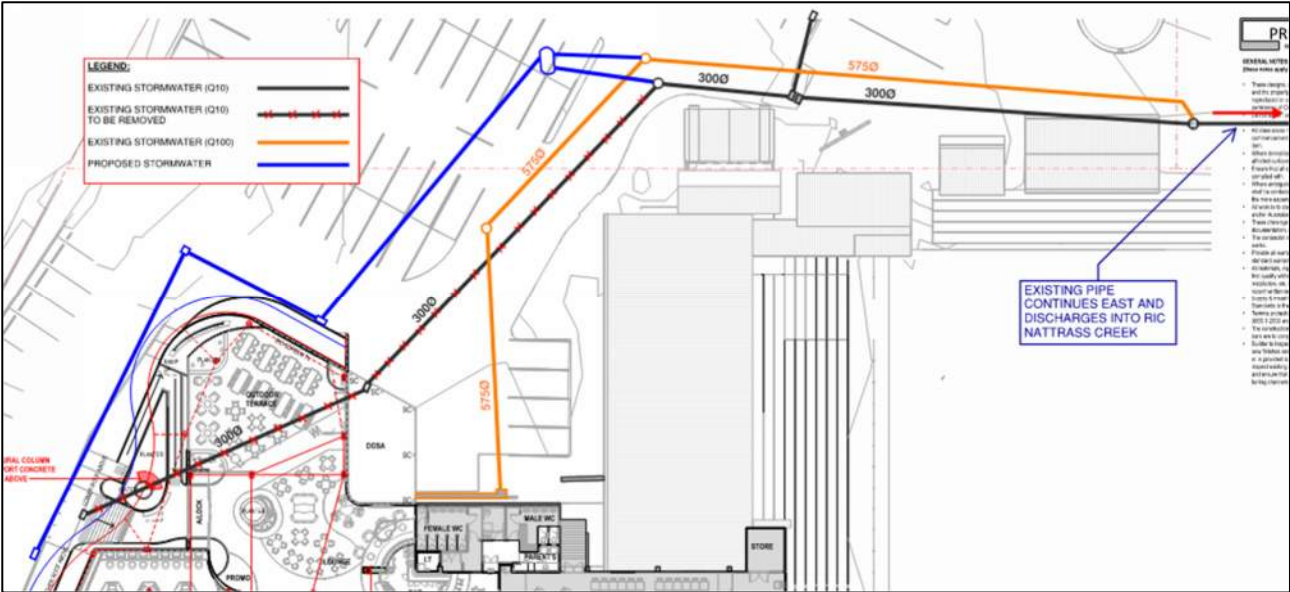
Existing and Proposed Stormwater Layout Sketch
